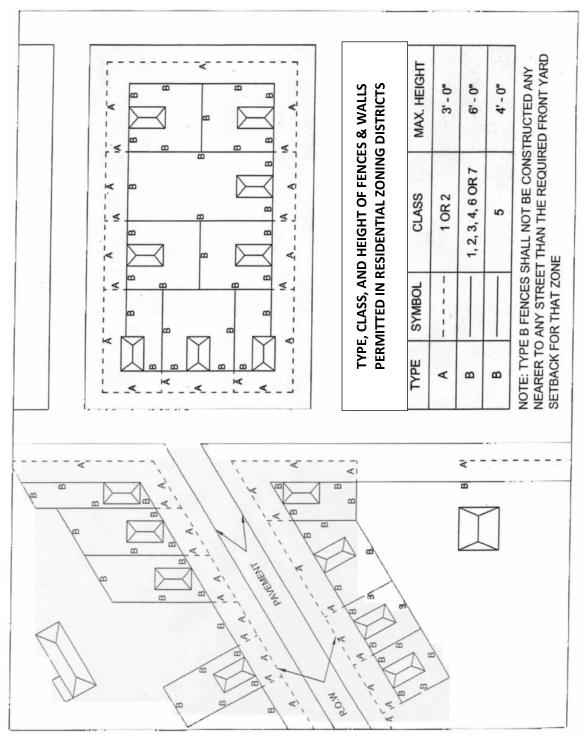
TYPE, CLASS, AND HEIGHT OF FENCES & WALLS PERMITTED IN RESIDENTIAL ZONING DISTRICTS
